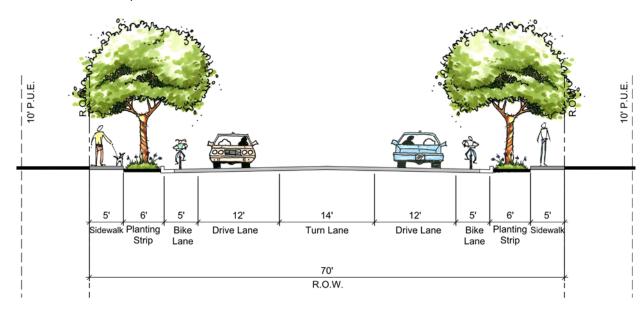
'B' Street - Milo Candini Drive - Section
